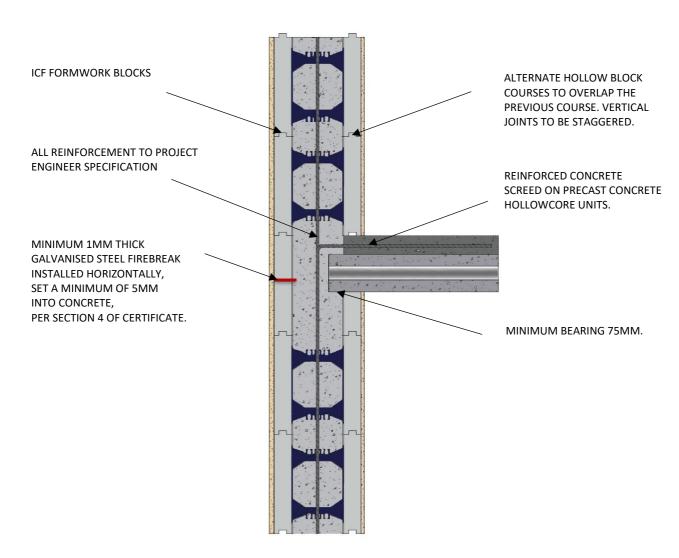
Altherm External wall - Bearing Detail for Precast Floor
